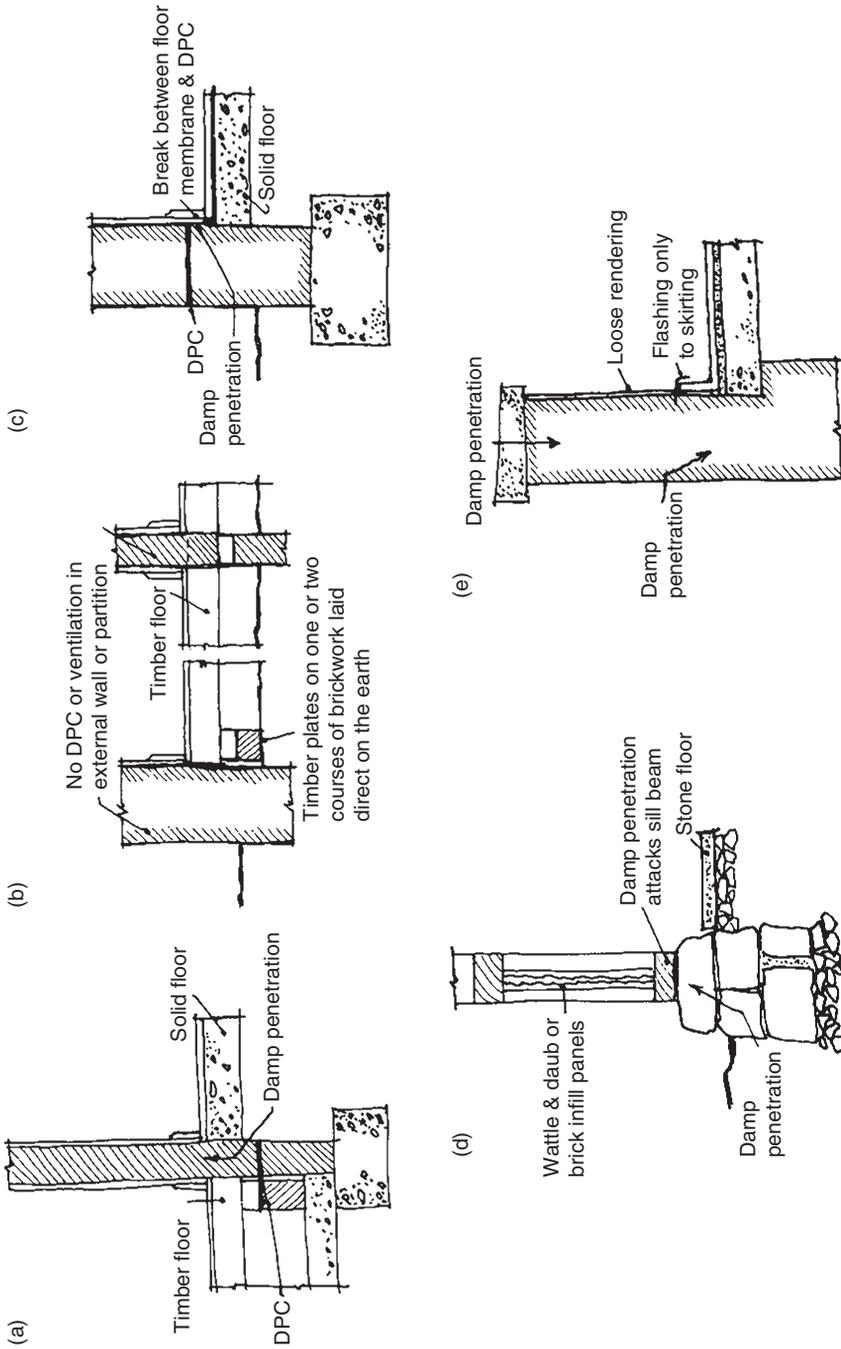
(a) Incorrect DPC insertion in partition wall. (b) Typical early nineteenth century timber floor construction. (c) Inadequate jointing between floor membrane and DPC. (d) Typical base detail of timber framed building. (e) Defects caused by the absence of DPCs in parapet wall
